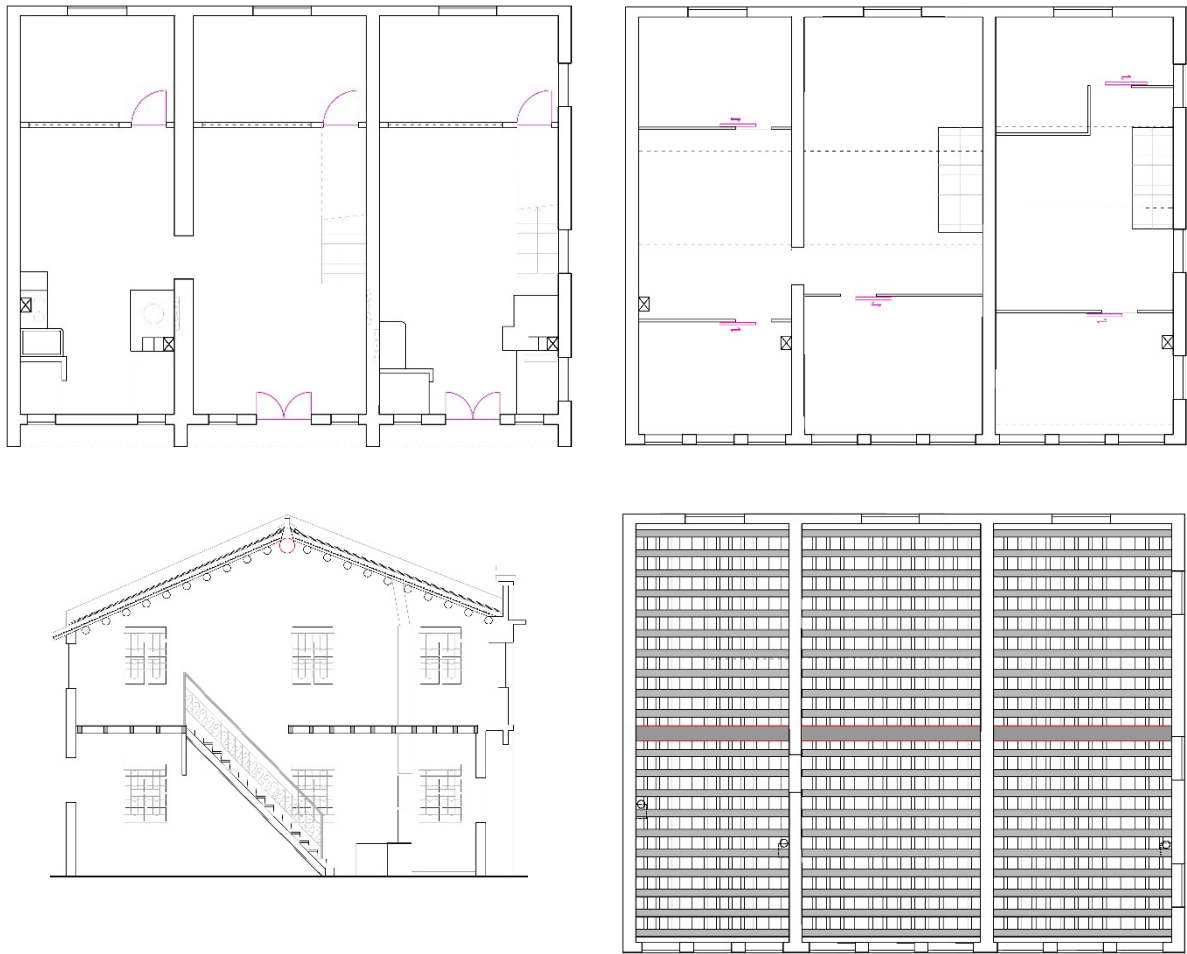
Ground floor plan, upper floor plan, section and reflected ceiling plan of the building.
